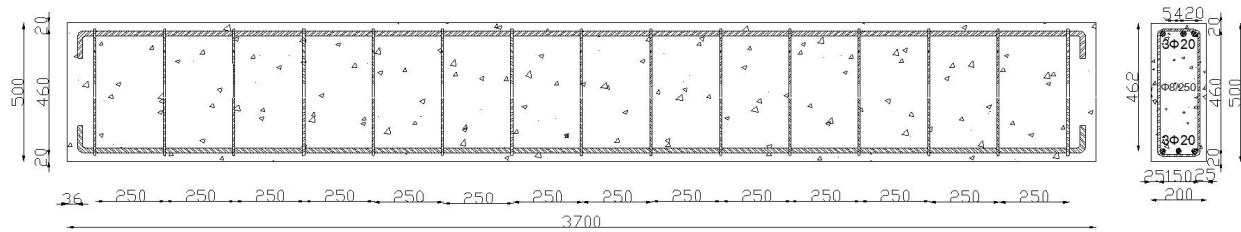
Dimensions (in mm) and structural details of specimen *Beam-1*. Longitudinal reinforcement: 3Φ20 at the top and 3Φ20 at the bottom. Transverse reinforcement: Φ8/250.
